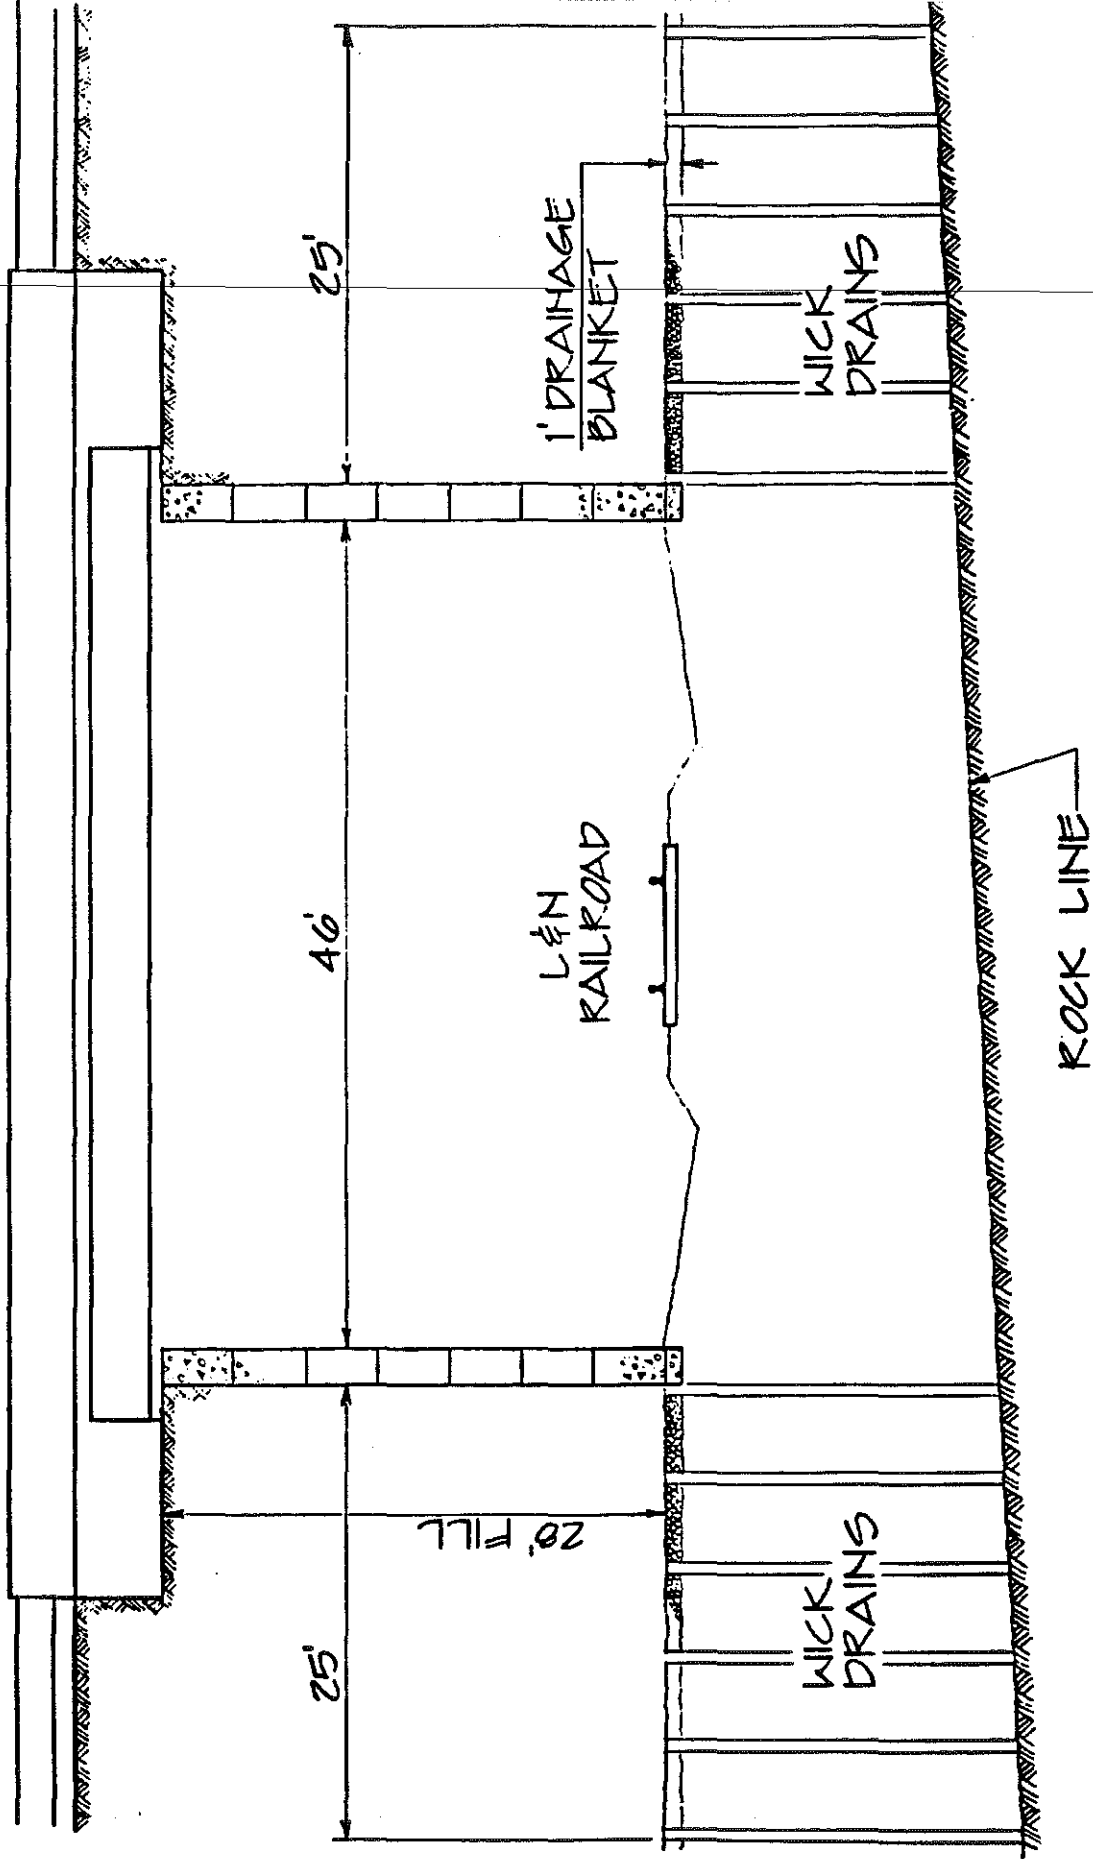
Centerline Section of Site (I 65 over L&N Railroad).
